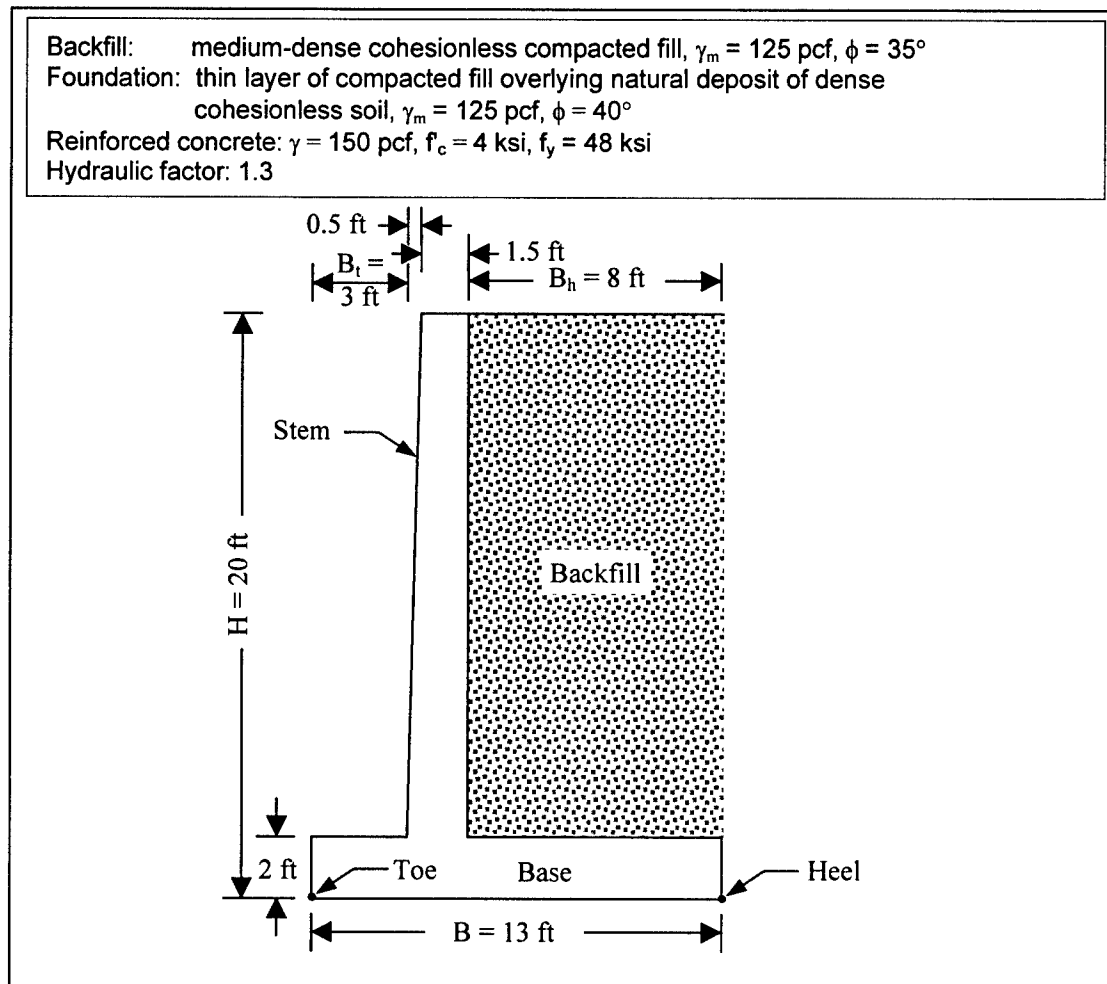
Structural wedge of proposed wall, and backfill and foundation properties
